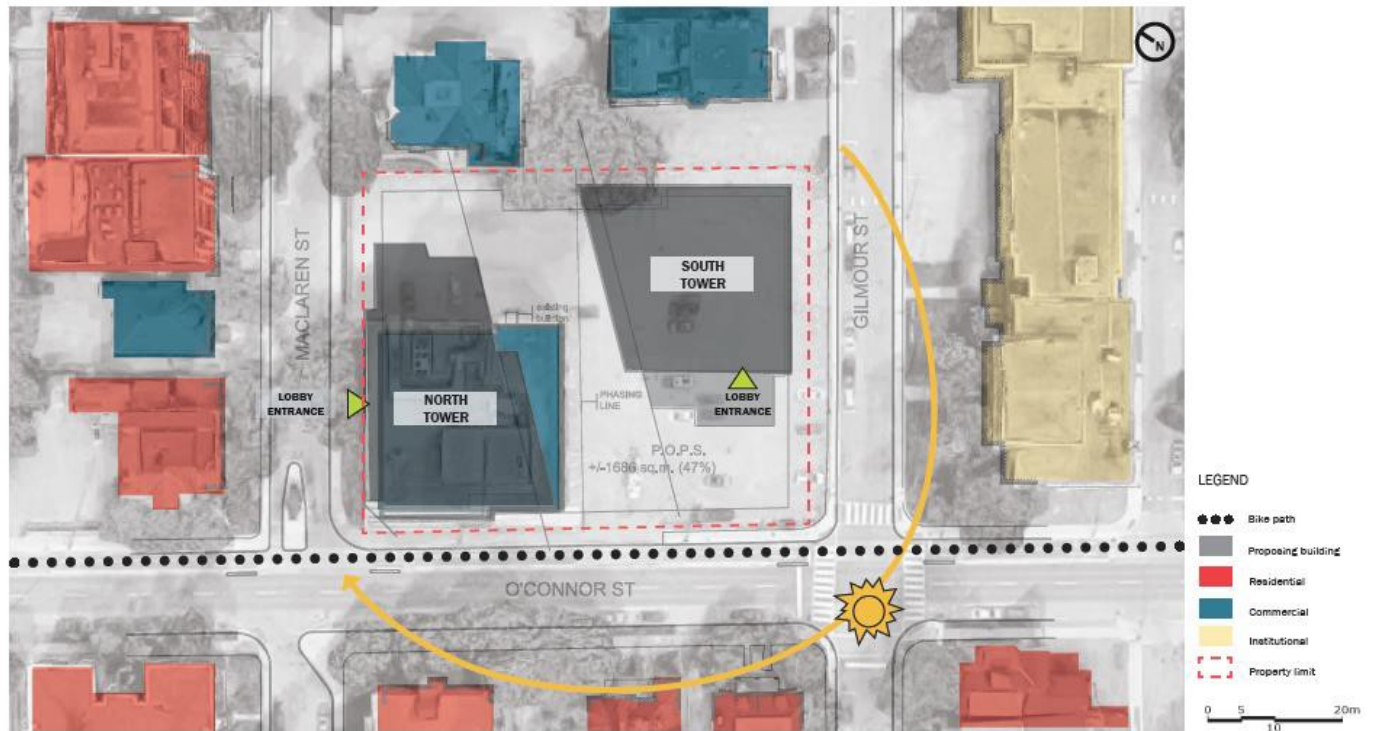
The placement of the two towers on the lot takes advantage of the southern exposure. Both towers are positioned proud of the setback of existing heritage buildings along MacLaren and Gilmour Streets. Source: *Projet Paysage 2020*.
